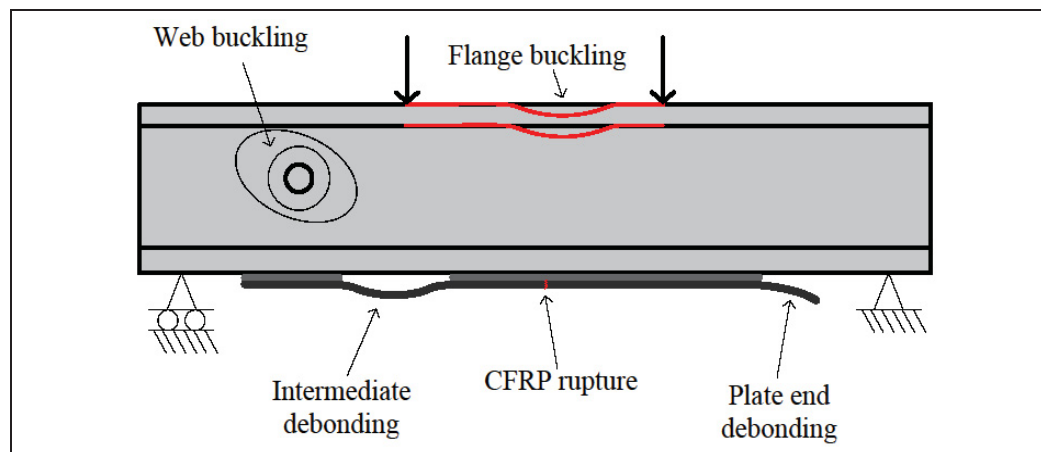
Some of the failure modes of steel beams strengthened with FRP plate
